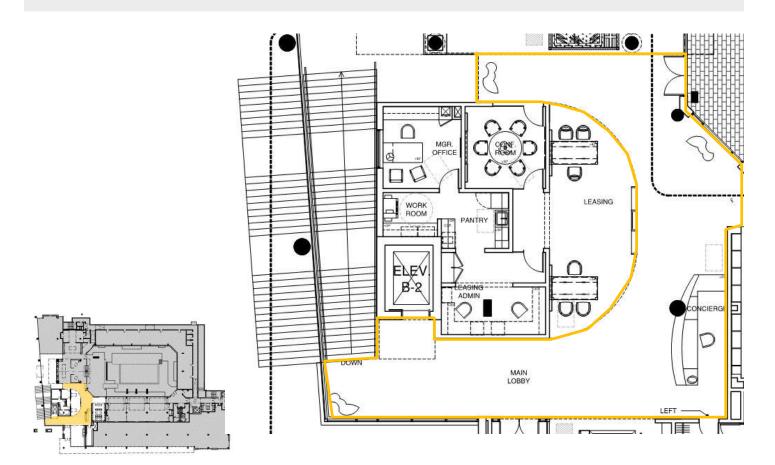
| West Elevation - Main Lobby + Concierge Desk
